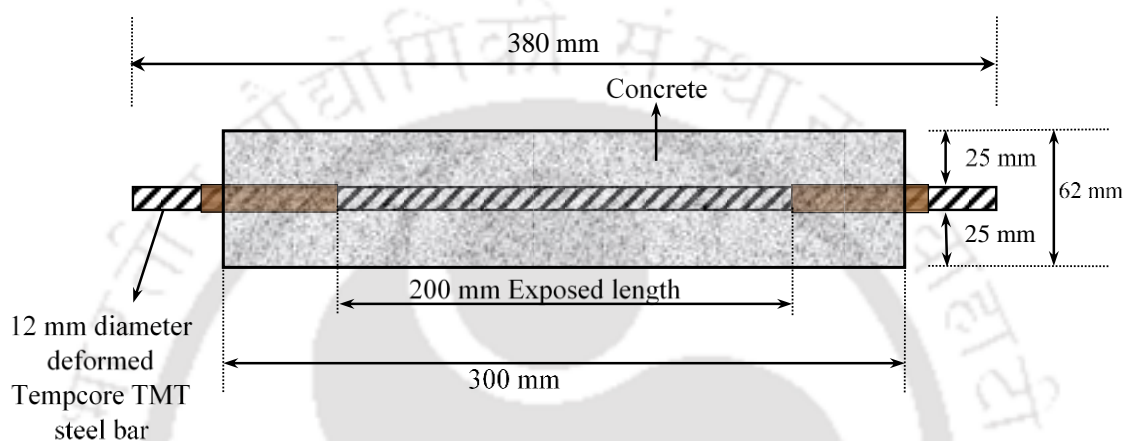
Schematic diagram of prismatic reinforced concrete specimen of size 62 mm × 62 mm × 300 mm
